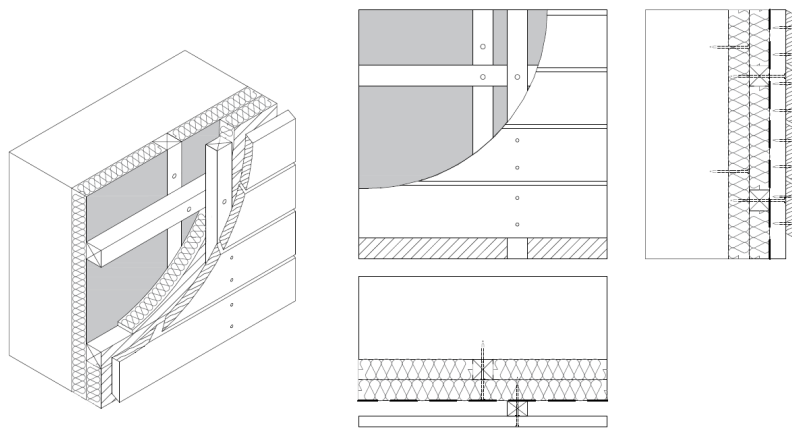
Horizontal external timber cladding and battens on secondary battens with flexible insulation
